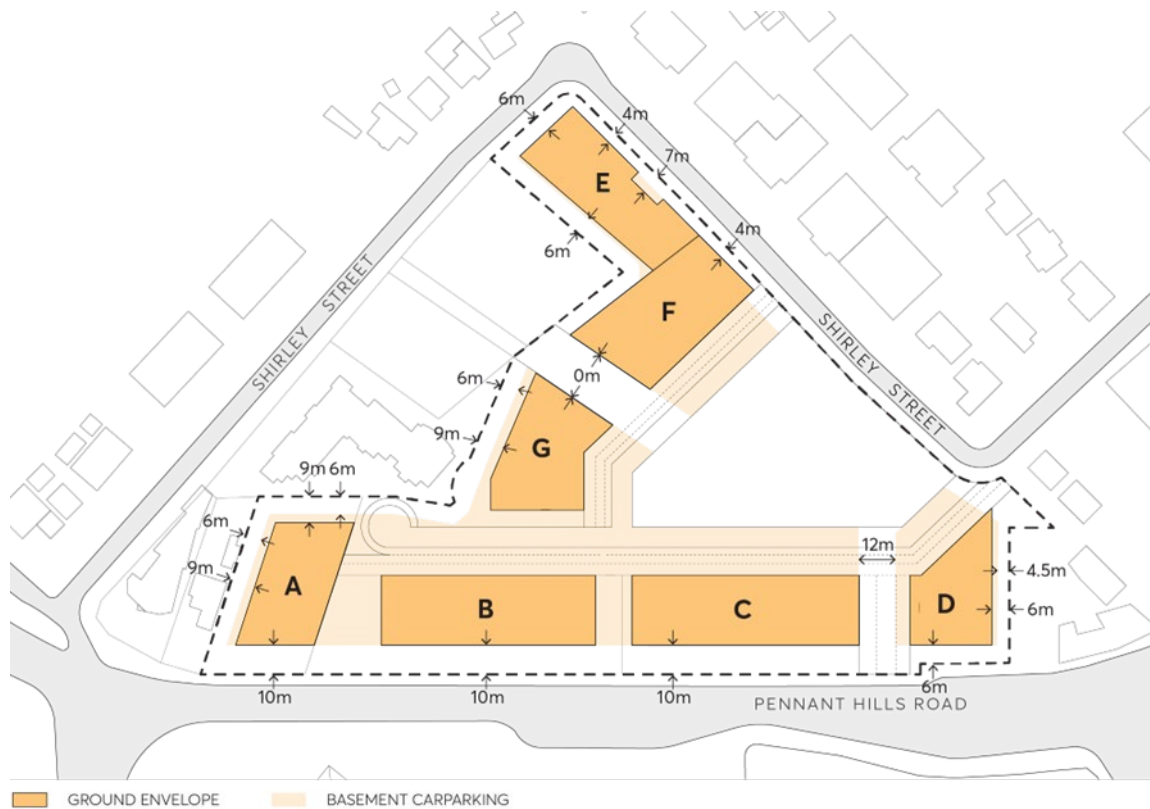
Minimum required basement and ground level building setbacks
